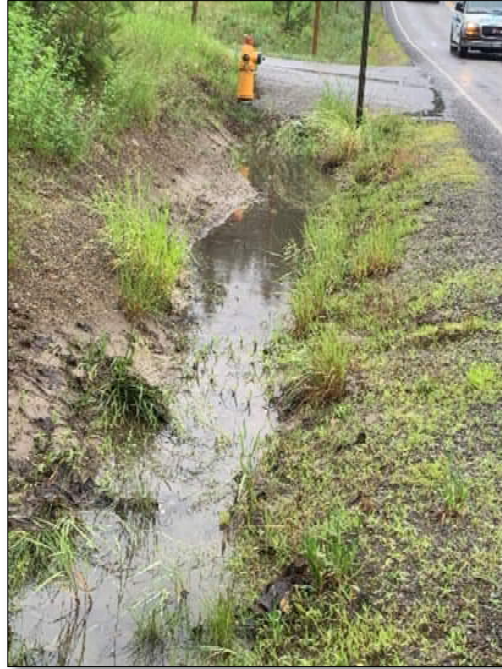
Outfall 10 Swale/Culvert (2023 Wet Weather Inspection)
